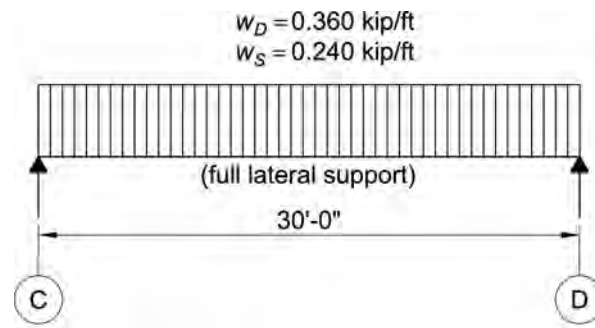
Loading and bracing diagram for roof beams in mechanical area.
